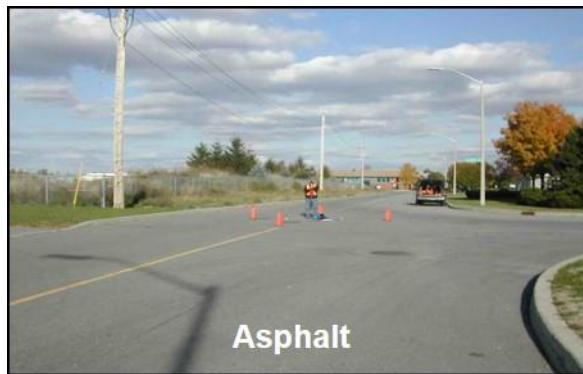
Asphalt is an example of a Paved and Flexible Road Surface in the ORN.
